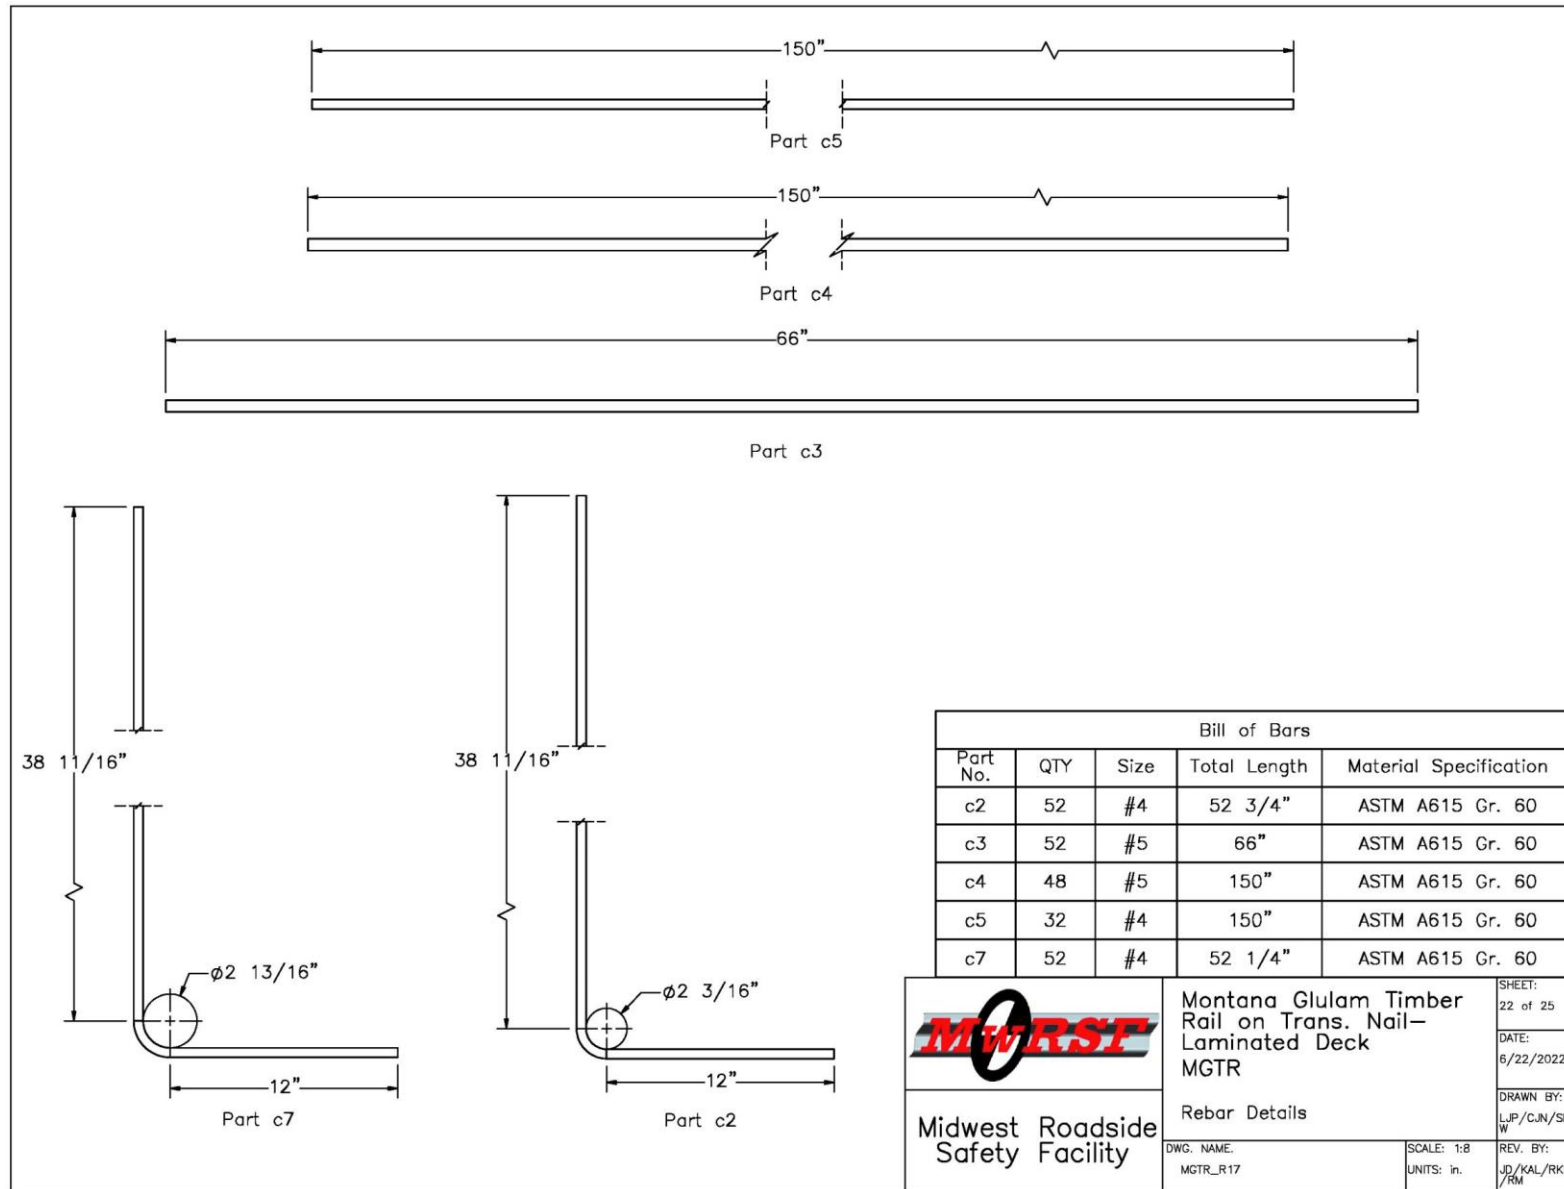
Rebar Details, Test Nos. MGTR-1S and MGTR-1D
